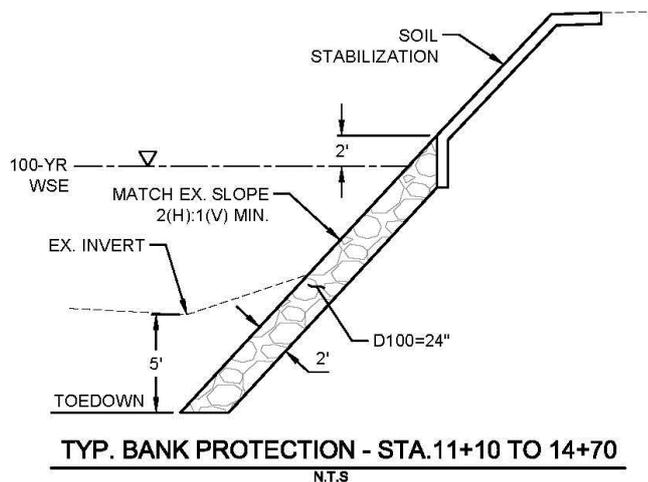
Typ. Section of Bank Protection downstream of Confluence (Alternatives 2 and 3)
